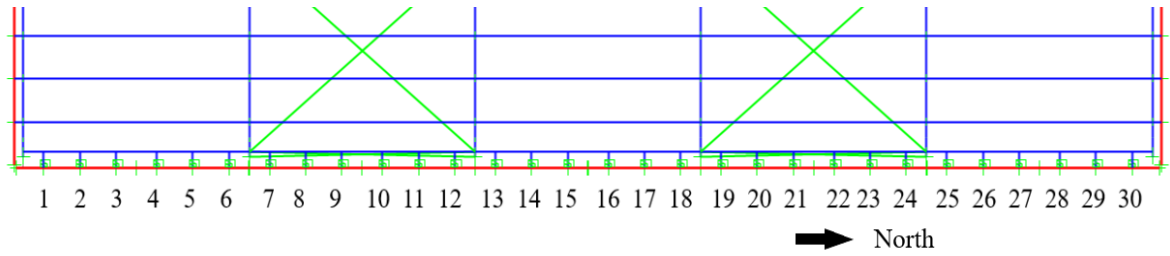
East Wall RFC Identification (Model 138 Plan View)
